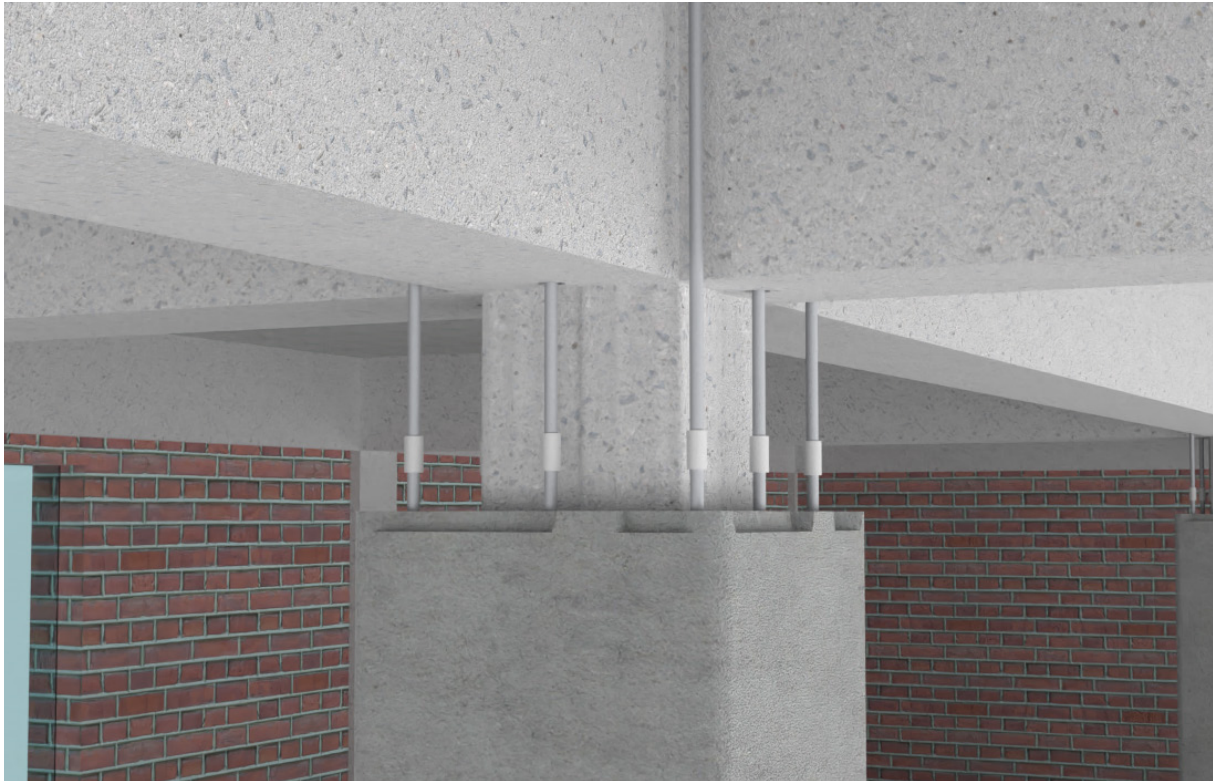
Step 10: In this step, the end of the longitudinal rebar is connected to a new rebar by using mechanical rebar couplers. This ensures that a new batch of modular blocks, stirrups and shear dowels can be placed to further build the retrofit system.
